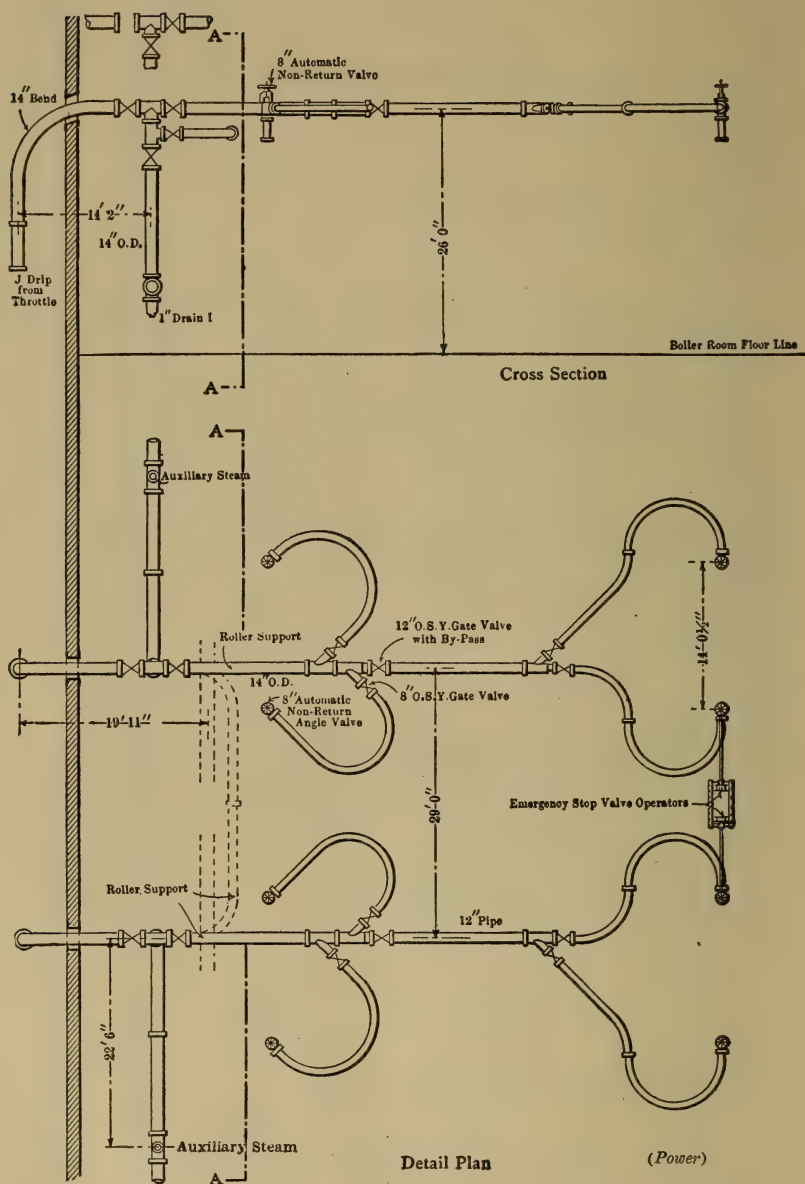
Details of Boiler Steam Piping, Yonkers Power House of the New York Central R.R.
